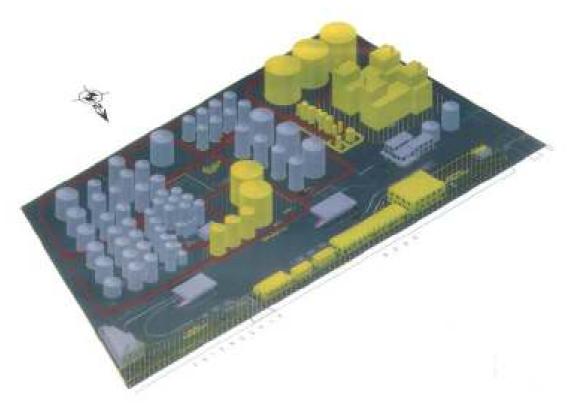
Vopak Site A – existing site shown in blue, proposed biodiesel facility and associated infrastructure shown in yellow
